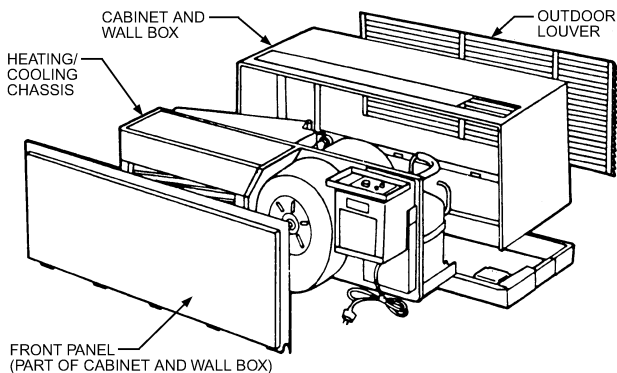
Integrated Packaged Terminal Air Conditioner [2016S, Ch 50, Fig 3]
